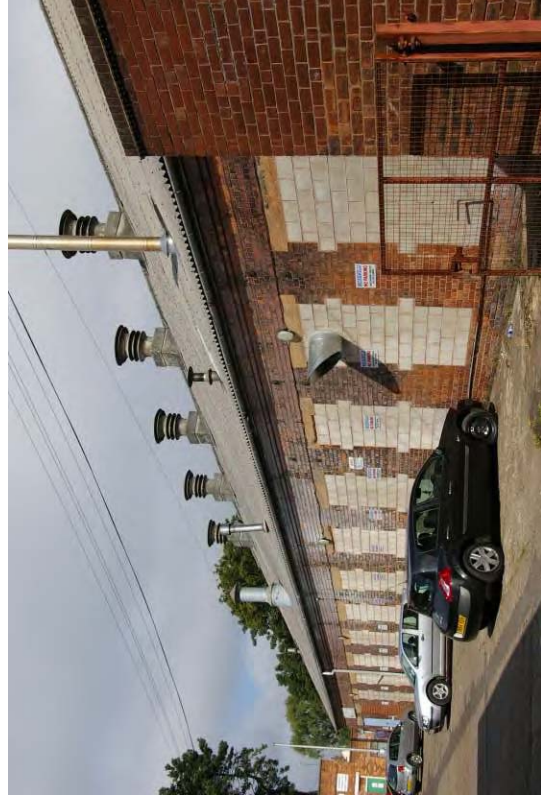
Blocking of openings on south elevation of former Sunbeam foundry
